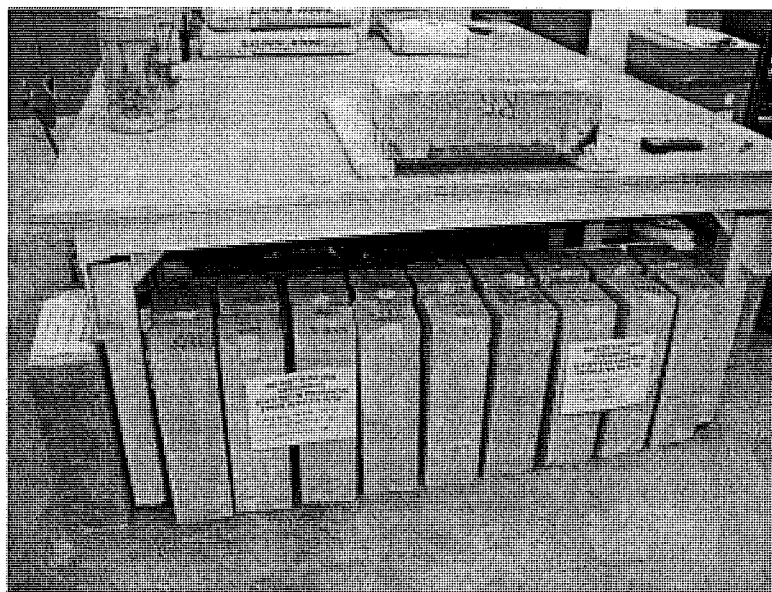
Repair specimens undergoing initial curing in a moist cure room
